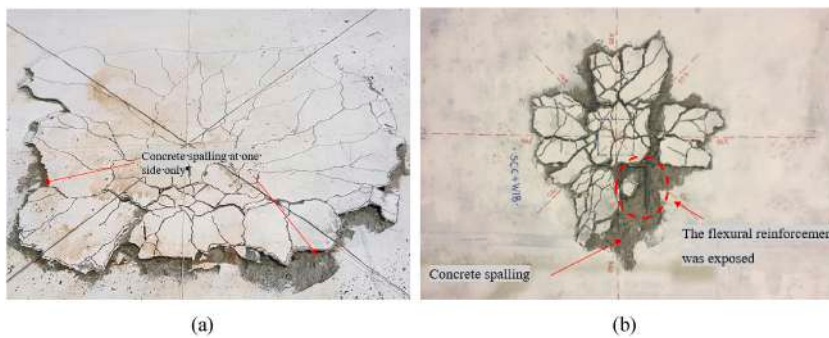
Brittle failure in slabs that were cast with plain concrete: (a) S2 without shear reinforcement and (b) S8 reinforced with WIB.
